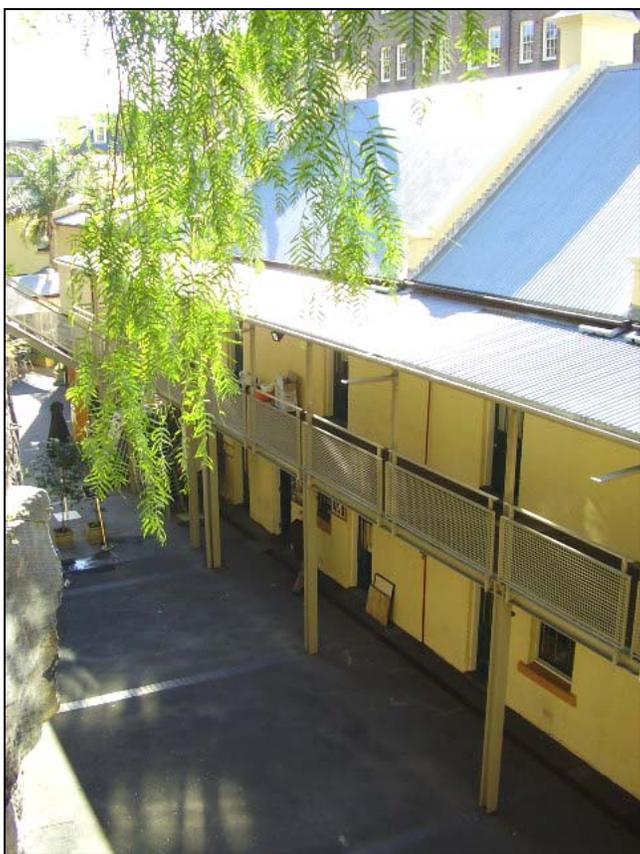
The painted brick, rear façades of the terraces are in good condition.
